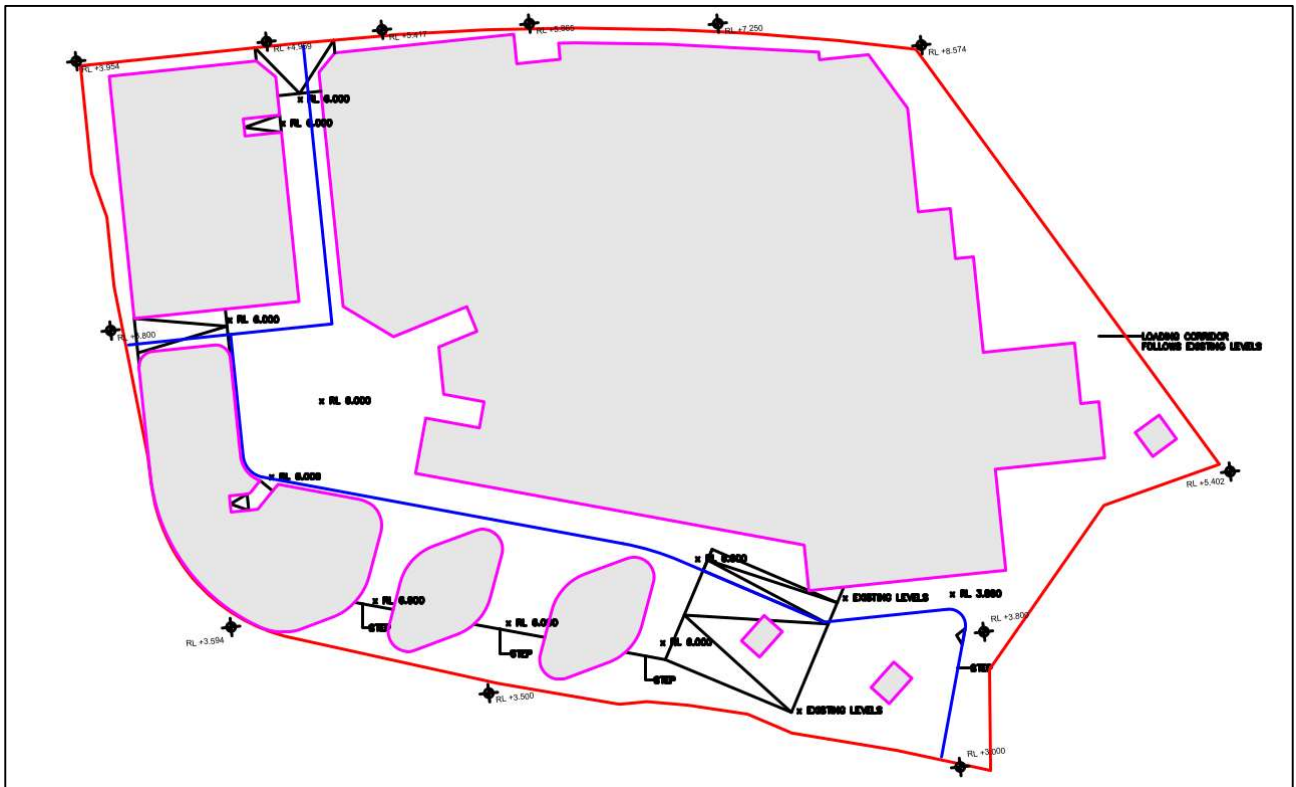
REFERENCE DESIGN LAYOUT – BUILDING FOOTPRINTS
